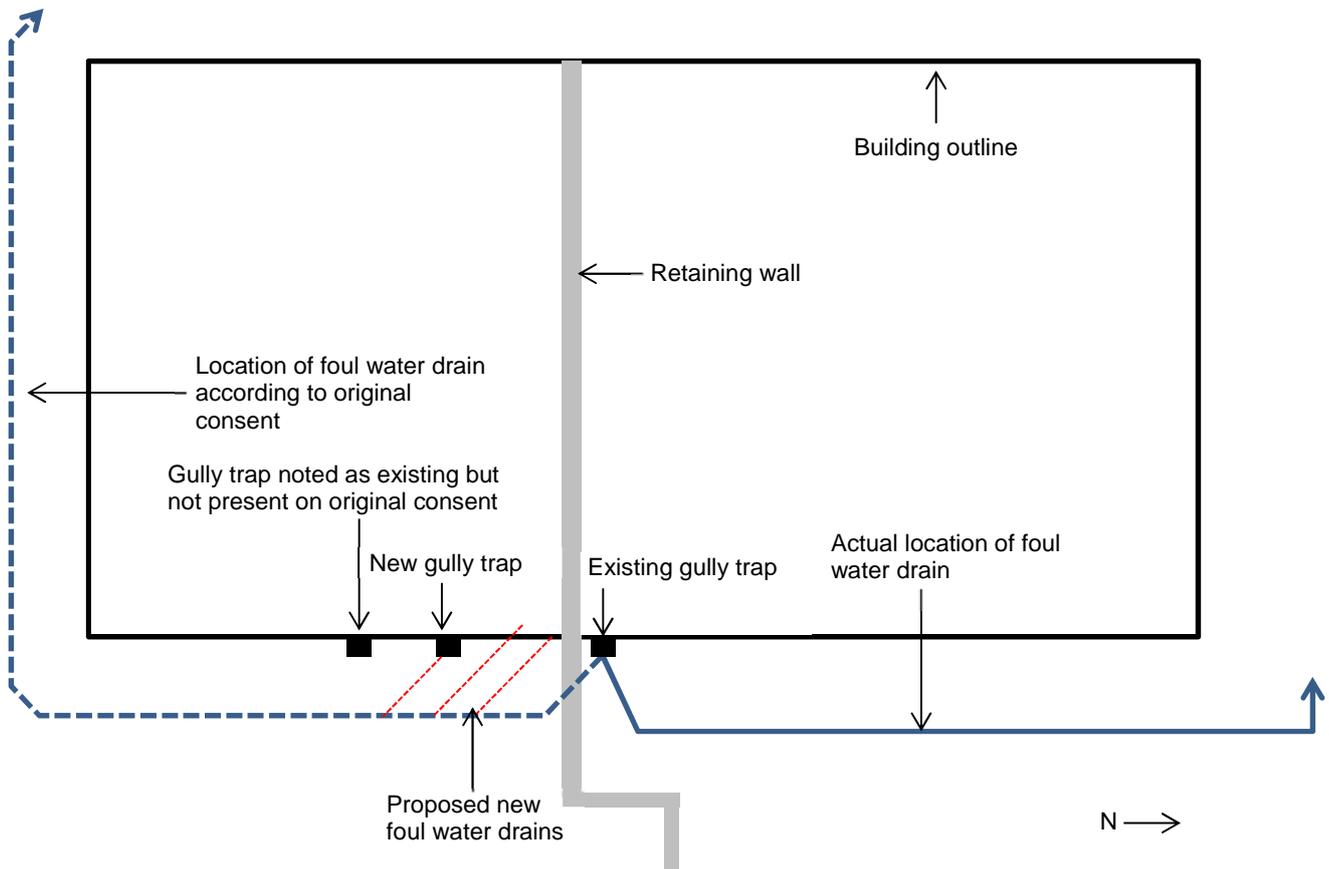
Diagram of proposed and existing drainage system (not to scale)
